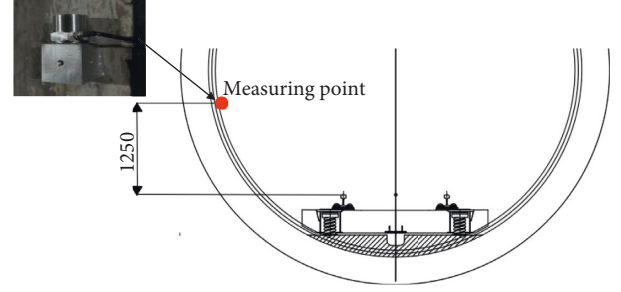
Measuring point location on the tunnel wall (unit: mm).
